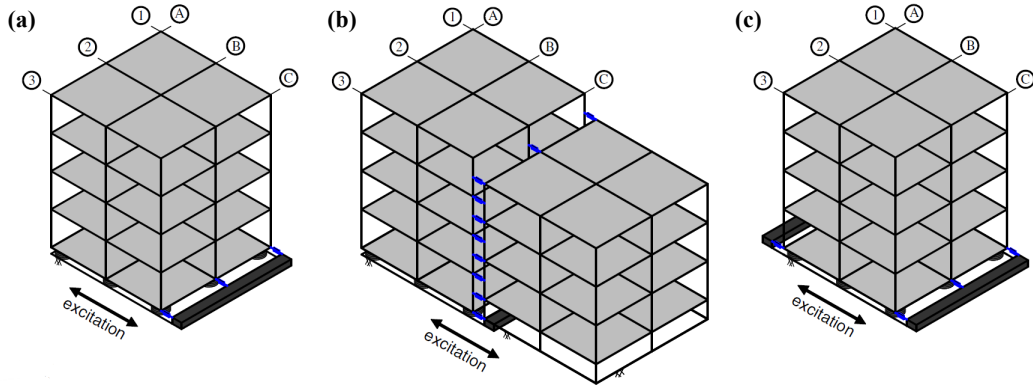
Schematic configurations of a seismically isolated multi-story building with a a retaining wall on one side; b a retaining wall and a conventional fixed-base building on one side; c two retaining walls on both sides [210].
